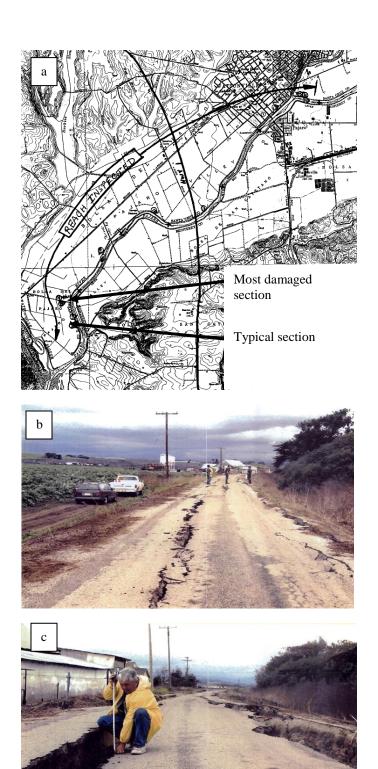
Transverse crack through entire levee section (photo David Ricketts).
